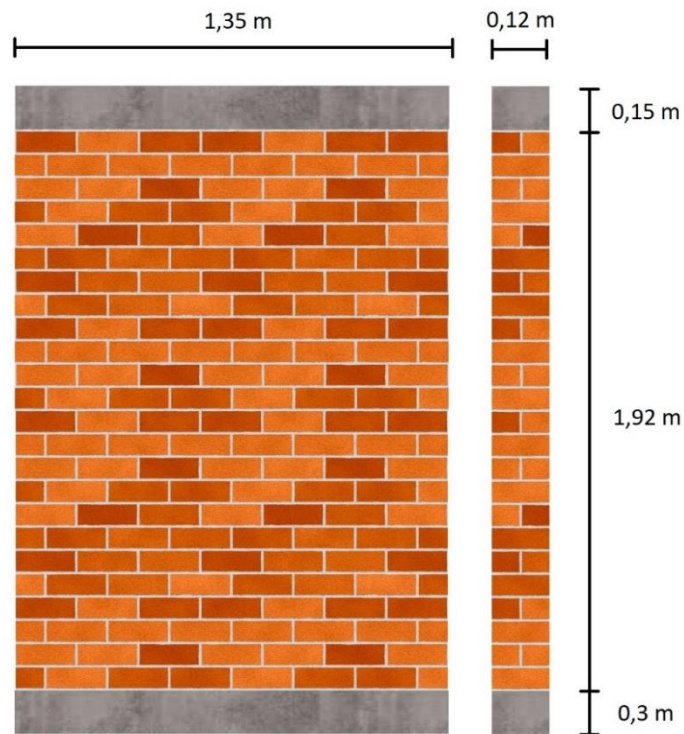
Dimensions of masonry walls from test made by López Restrepo (2013) (Figure by authors)
